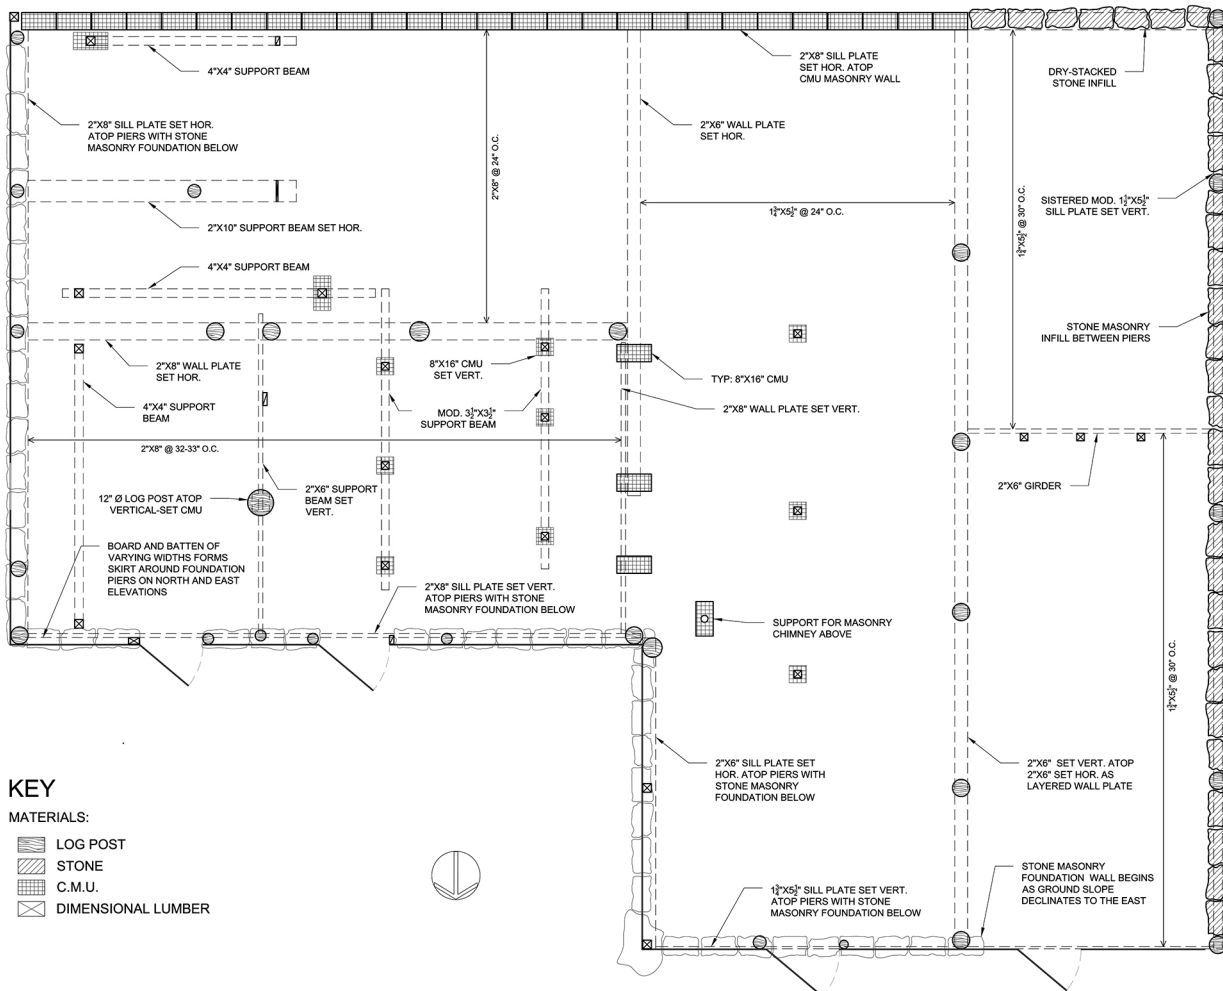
Plan of existing foundation of Higdon Cabin. See Appendix for full-size drawings.
